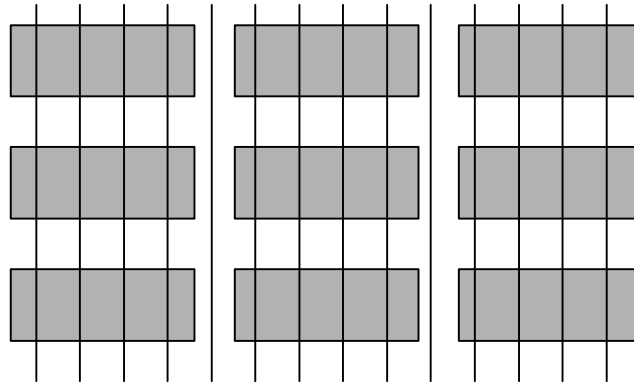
Road widths and pillar shapes can be adjusted to cater for areas of intensive jointing without changing the direction of sections.
